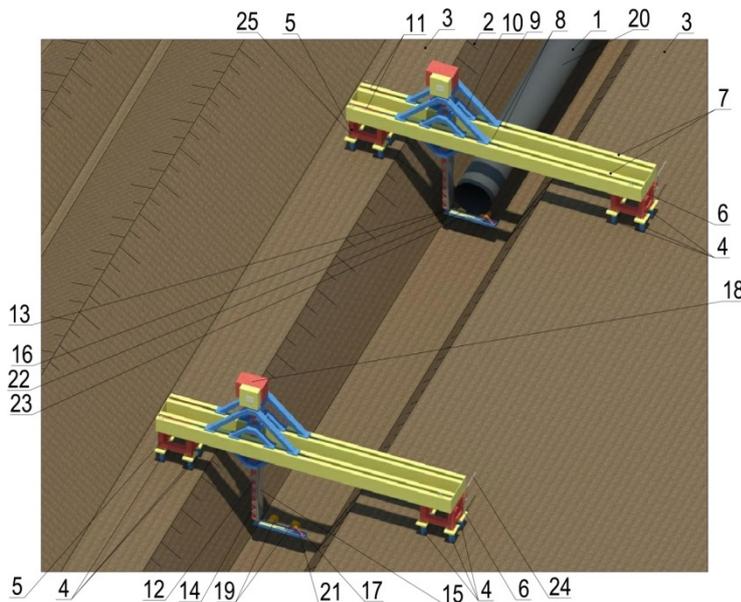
Spatial view of the proposed device for supporting a pipeline section under major repair: 1 – main pipeline, 2 - trench, 3 – lateral sides of the trench, 4 – screw pile, 5, 6 – spatial metal frame, 7 – guiding casing, 8 – system of guiding rollers, 9, 10 – spatial movable frames, 11 – hydraulic jack, 12 – the vertical support bearing element, 13 – rod with thread, 14 – telescopic shaped pipe, 15 – rubber coating, 16 -loops , 17 – horizontal support bar, 18 – actuator, 19 – two rollers, 20 – insulating coating, 21 – fixator, 22, 23 - hydraulic jack, 24 – lever, 25 – technological opening.
